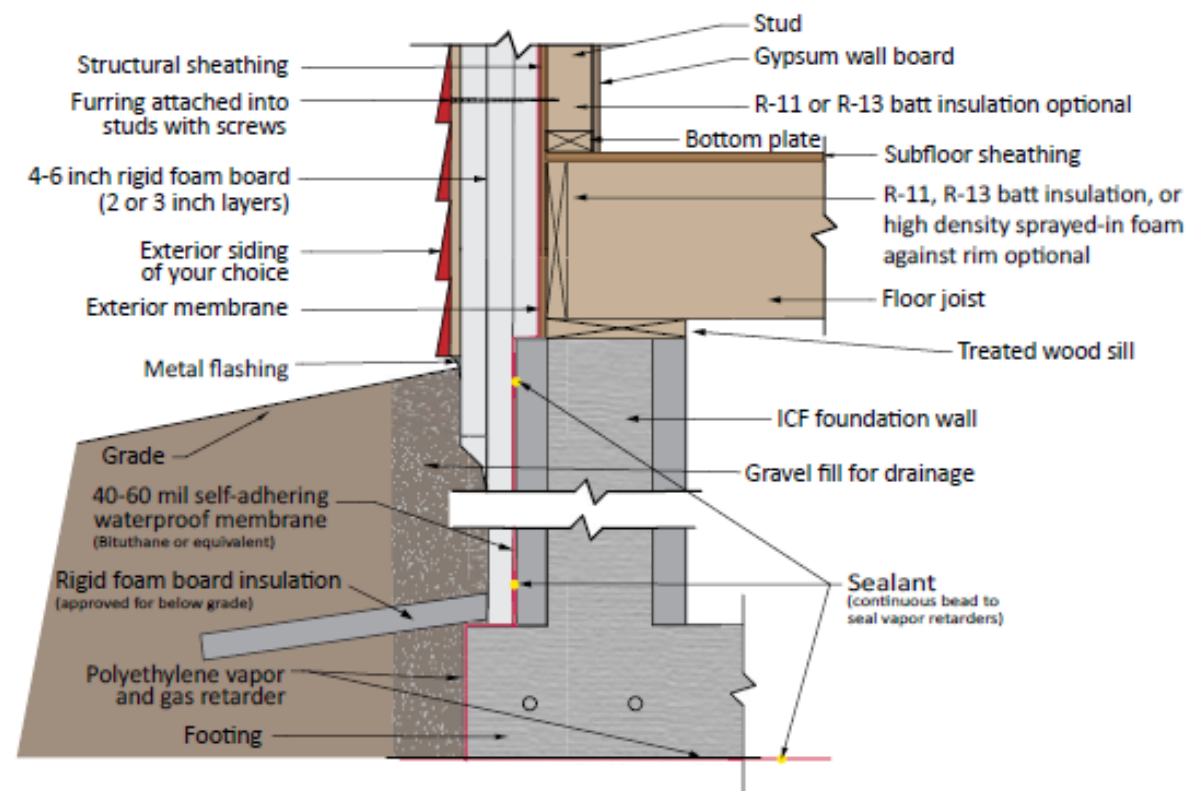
Details of the REMOTE wall (CCHRC, 2009)
